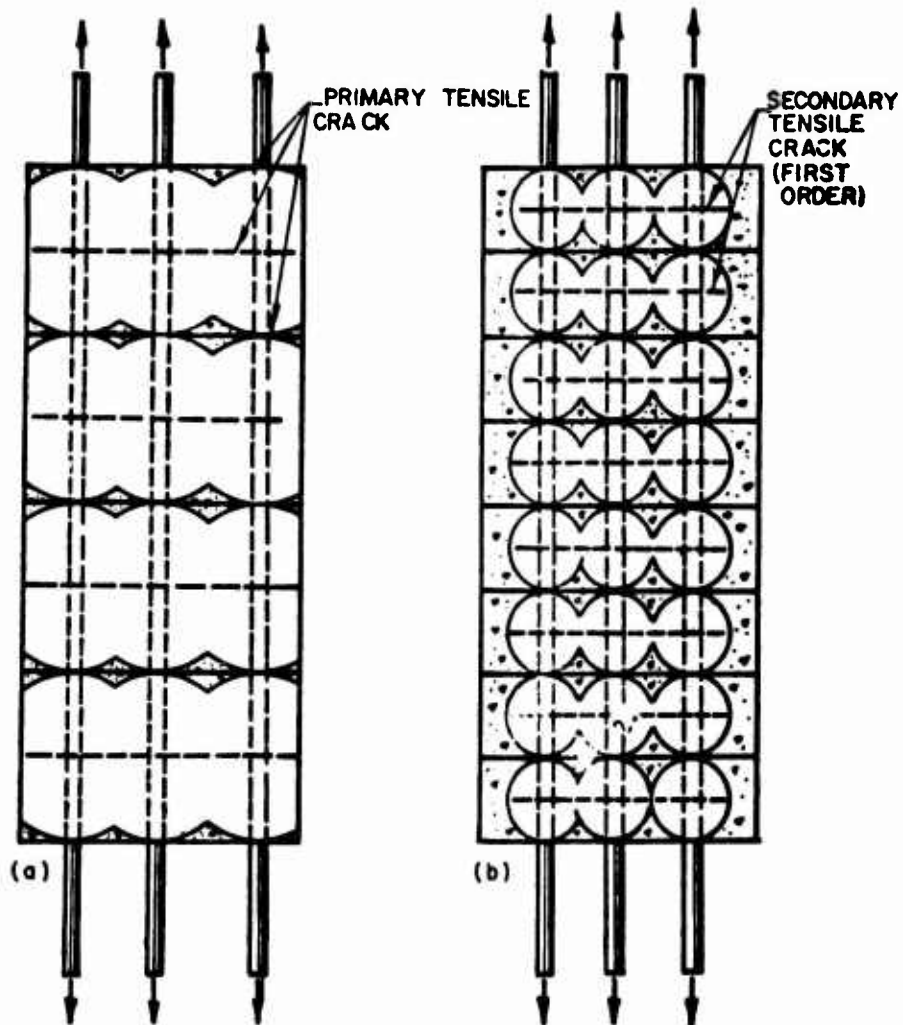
Mechanism of Tension Cracking (member reinforced with several bars) (Ref. 33)
